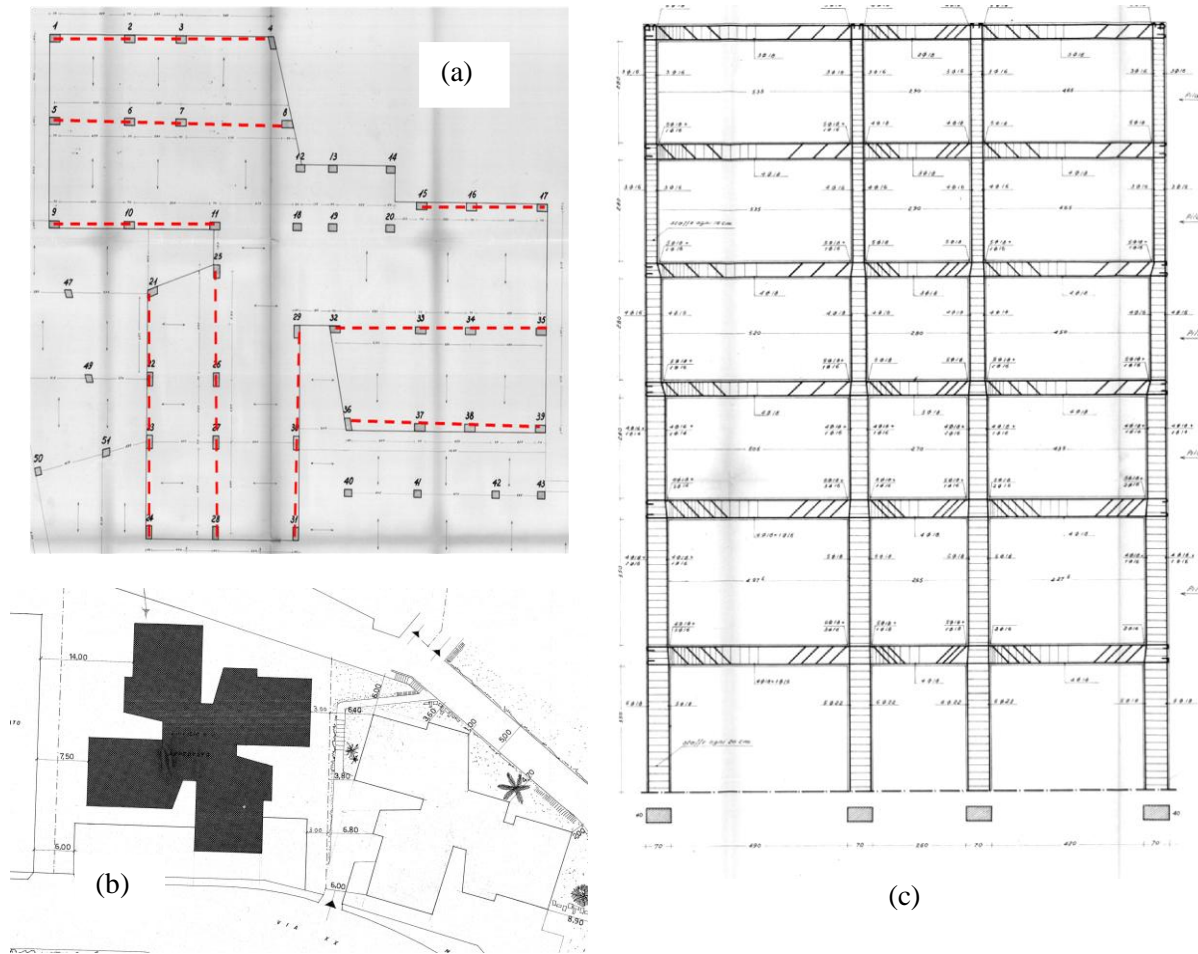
(a) Structural plan of the building with column numbering and plane frames; (b) comparison with plan configuration of the adjacent building; (c) main structural frame (typical).
